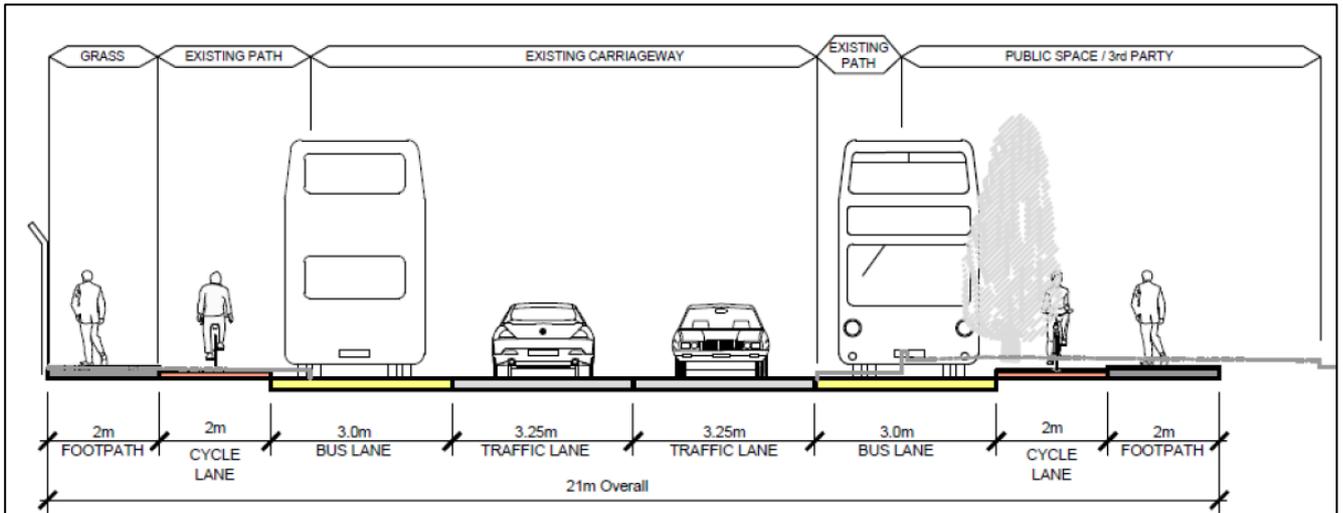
SY1B Cross-Section B-B Swords Road between Santry Avenue and the Omni Shopping Centre
